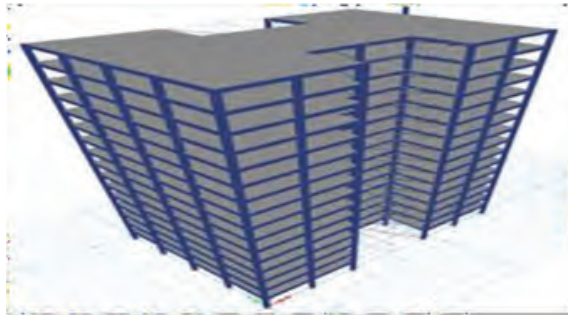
3D Model of G+15 H-Shaped Building with CFRP Circular Columns
